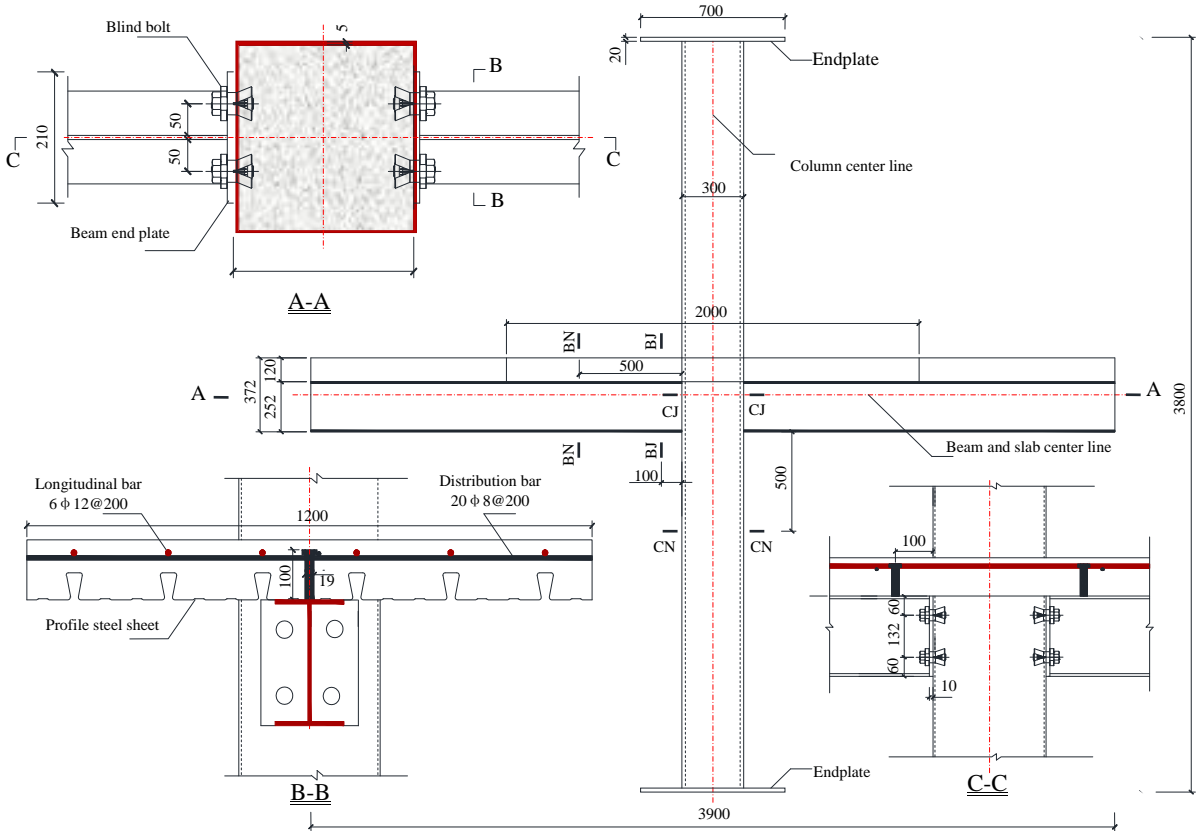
Dimensions of the CFST column to steel beam joint (Unit: mm)
